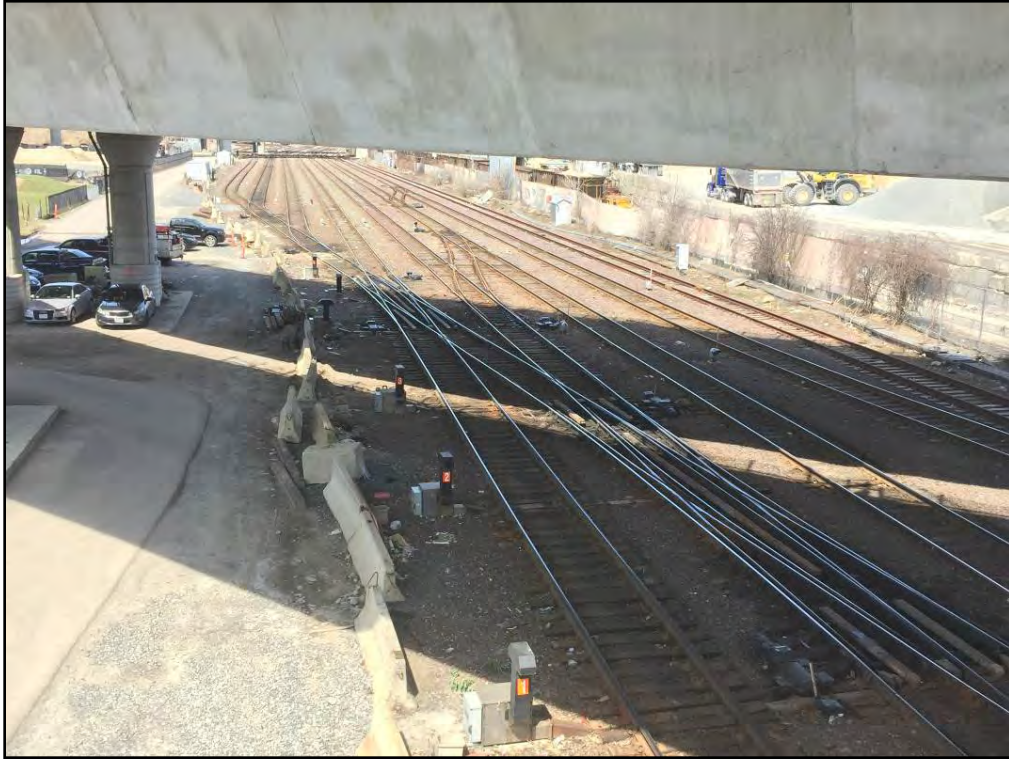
Tracks located north of Draw 1 Bridges, looking north.
